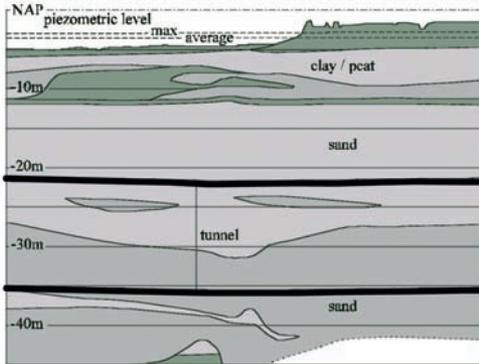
Geotechnical profile GHT tunnel in polder. Tunnel is drilled from right to left in this picture.
